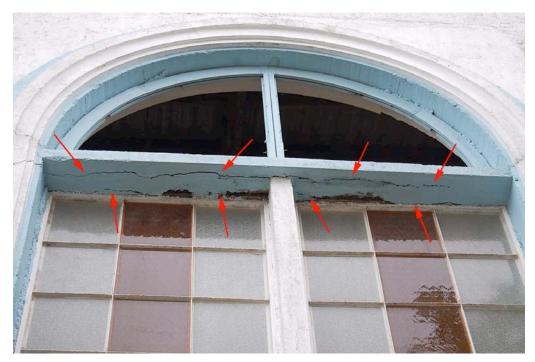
Typical view of steel casement windows with colored glass. The arrows point to cracks in the concrete transom bar, probably caused by rusting steel reinforcing bars, which is not seismic damage.
